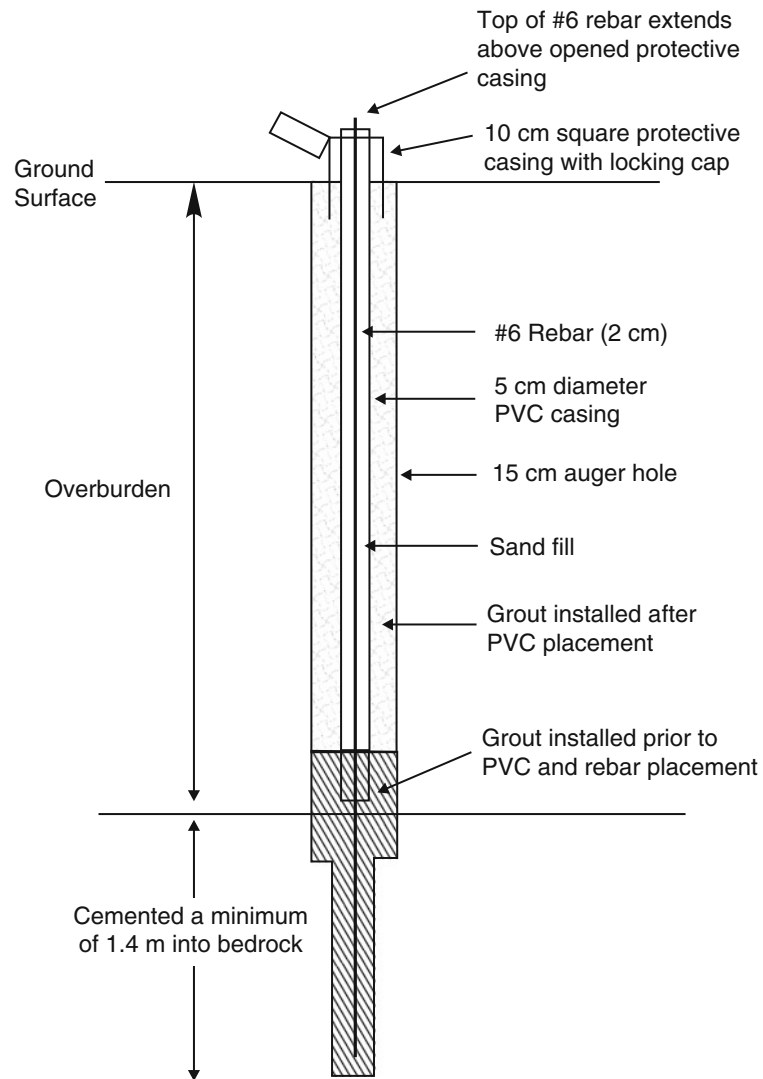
A benchmark consists of a rod or pipe anchored at depth
